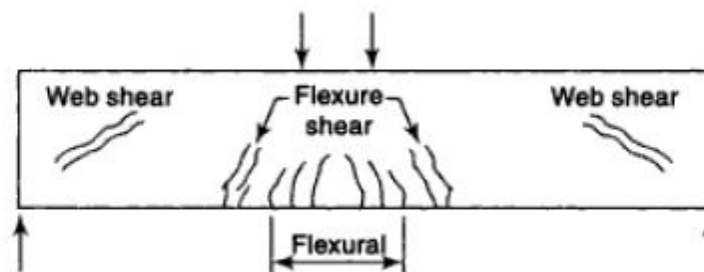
Types of Shear Cracks in Structural Concrete Members
